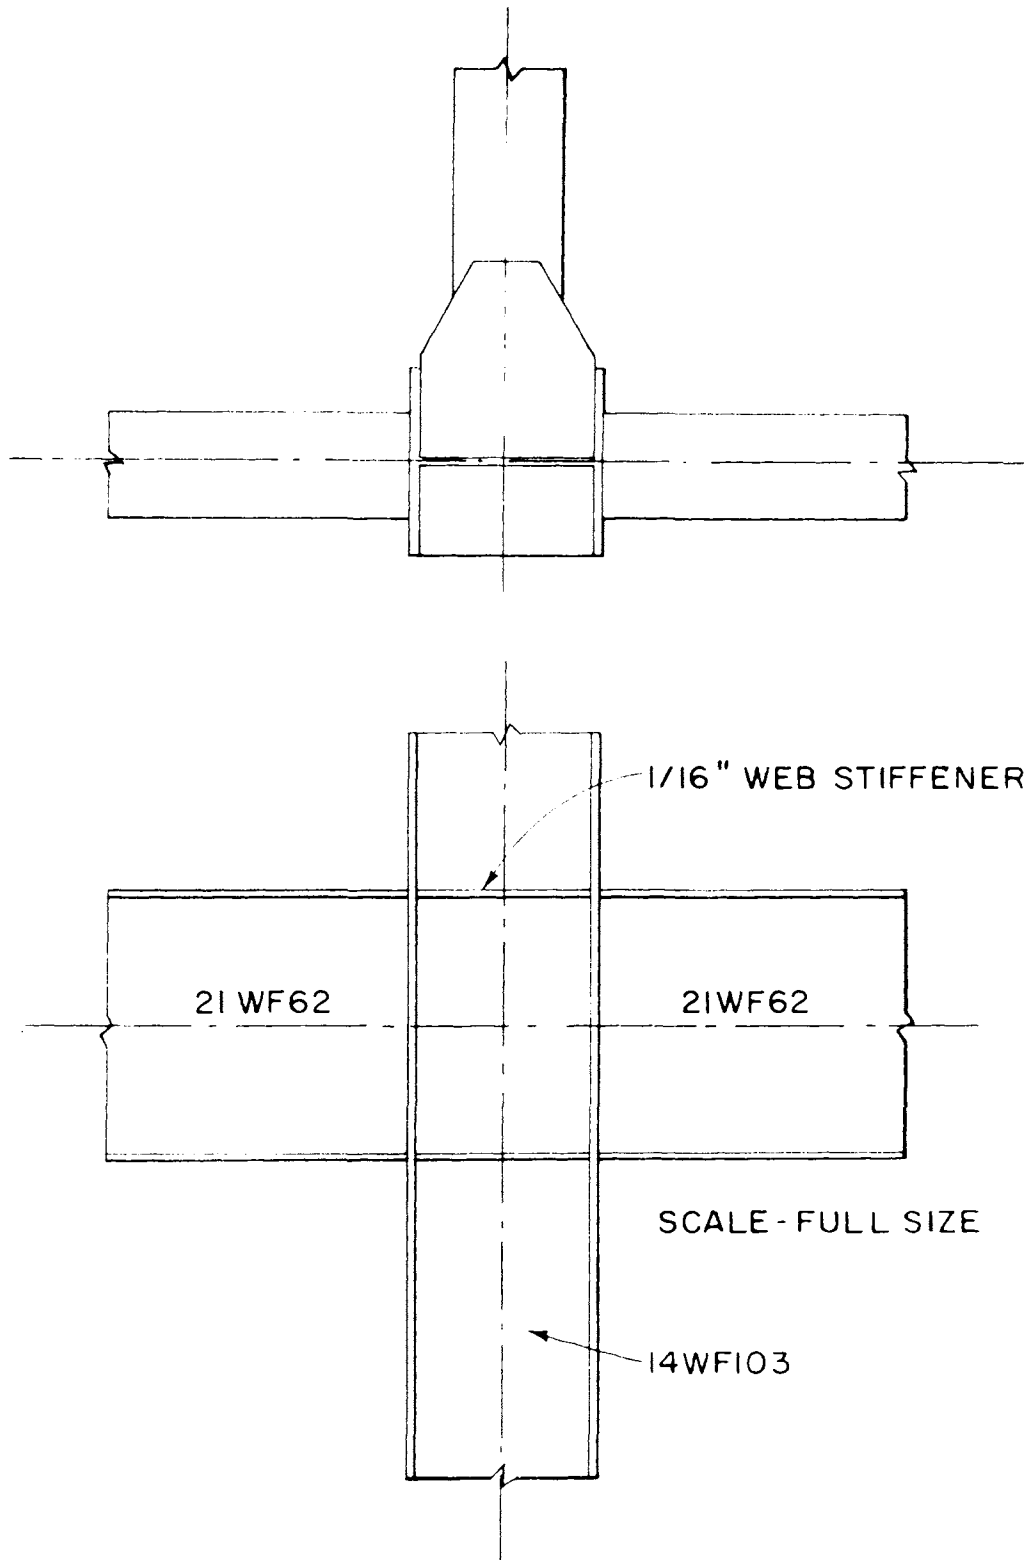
GIRDER TO COLUMN FLANGE CONNECTION
